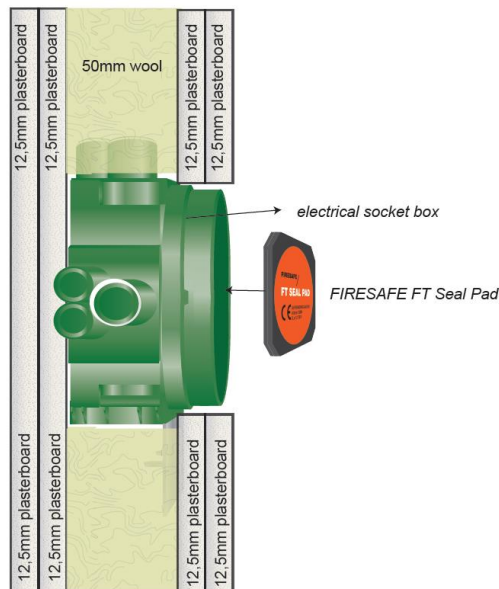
Single electrical wall box (size 1.5), fitted on one side of flexible wall – sectional view
